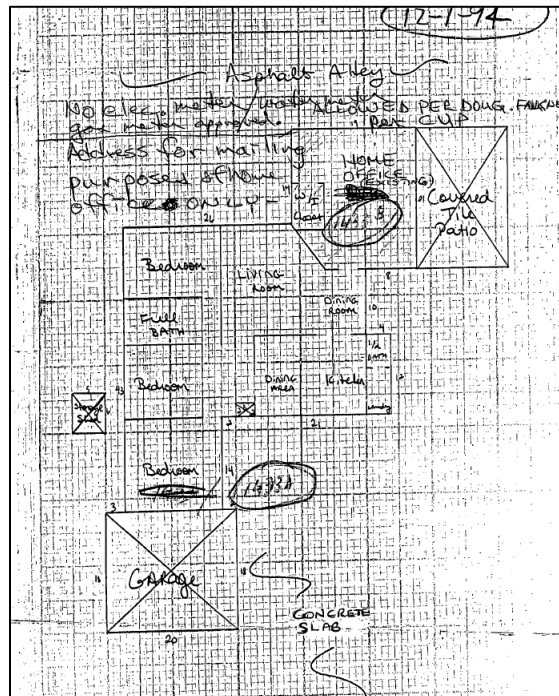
Drawn plans for construction of block wall on the property, which details the floor plan of the home (1994).
